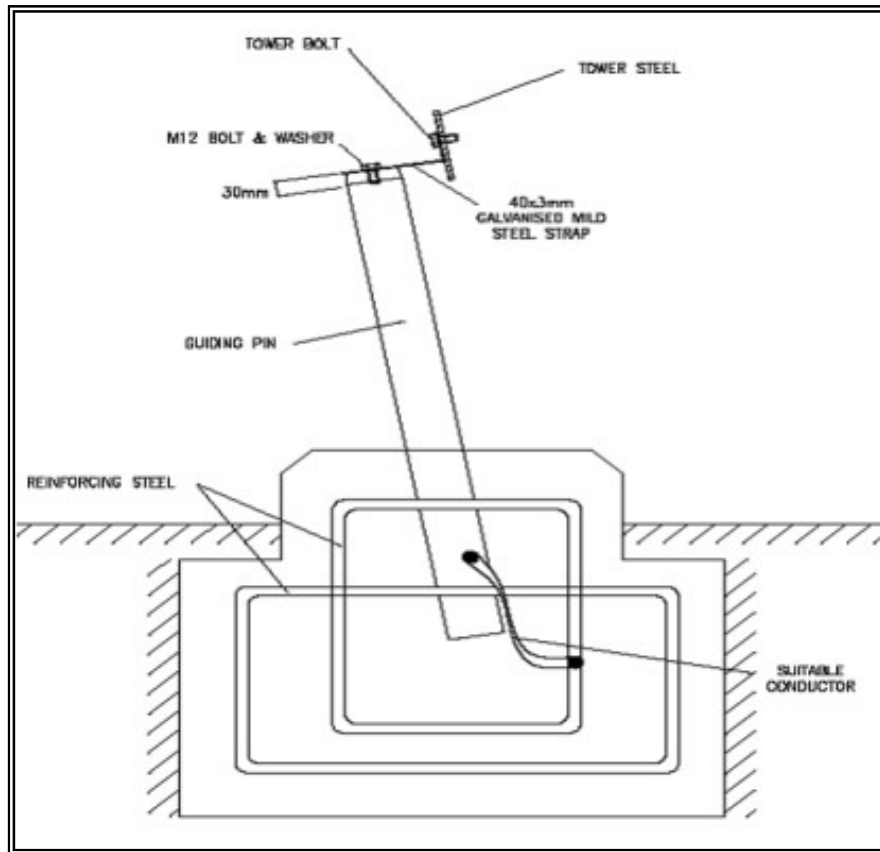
Tower Leg, Locating Pin and Foundation Rebar Connection
